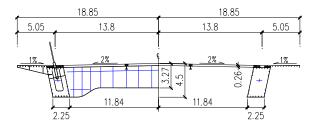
Girder cross section of the hybrid arch-girder bridge
